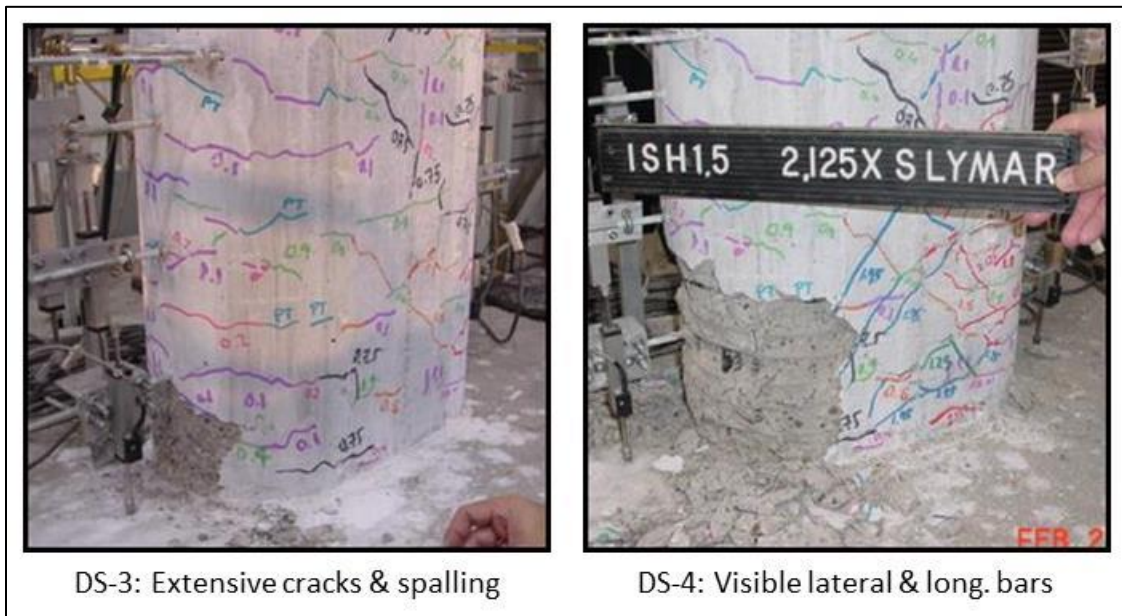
Damage States 3 and 4 - Apparent damage states in the RC bridge columns [20]
